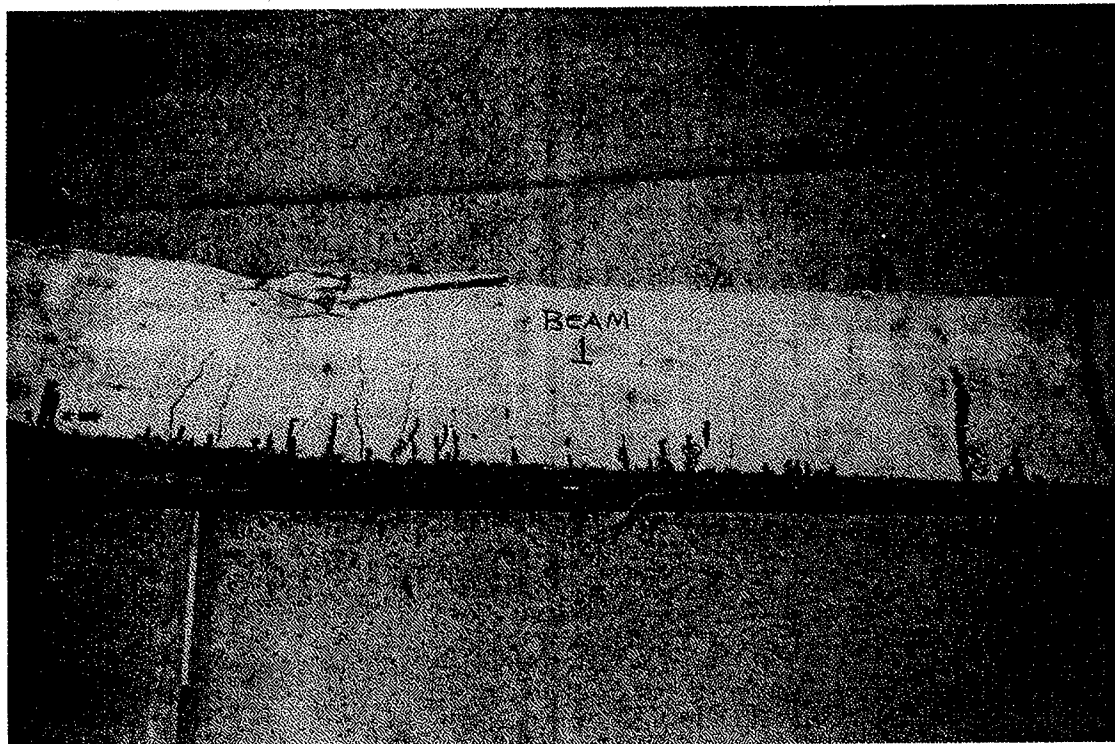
The five-layer CFRP debonded under flexural loading to failure.
